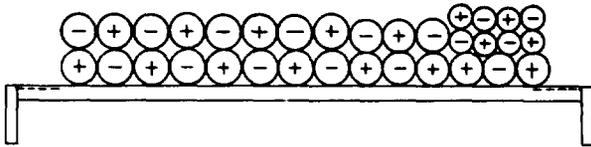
Pairing of Talking Conductors on Cable Rack—Typical Section (See 2.03)
